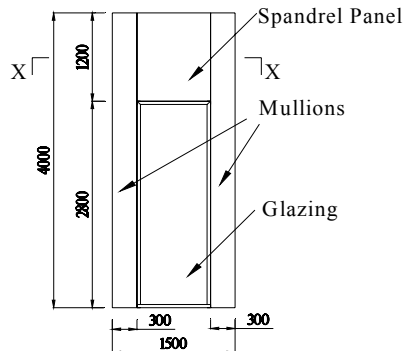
Front elevation of an FRP façade module, which consists of glazing, spandrel panel, mullions and joints.
